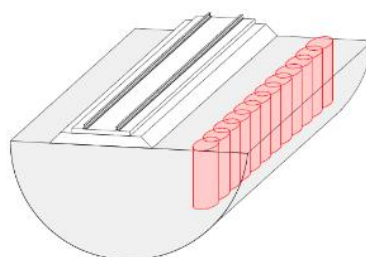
Sketch of the stiff wave barrier consisting of overlapping jet grouting columns. (Image: CEDEX)
